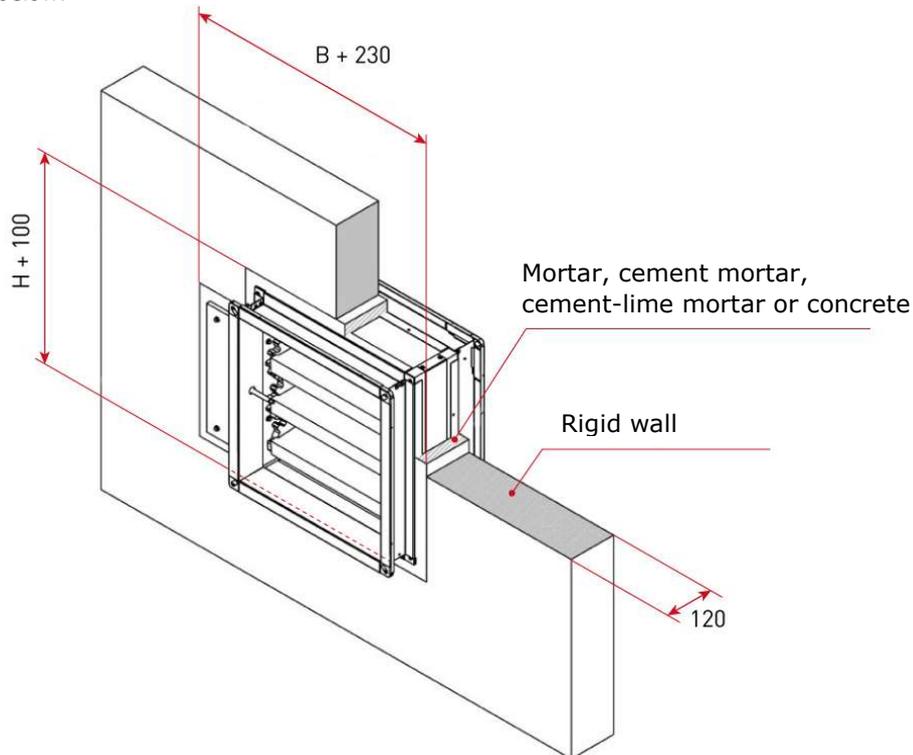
Dimensions of the installation opening of the WKP-O dampers in rigid wall with a horizontal and with vertical axis of rotation of the baffle, with planned cut for actuator housing. The C dimension is given in the table.
